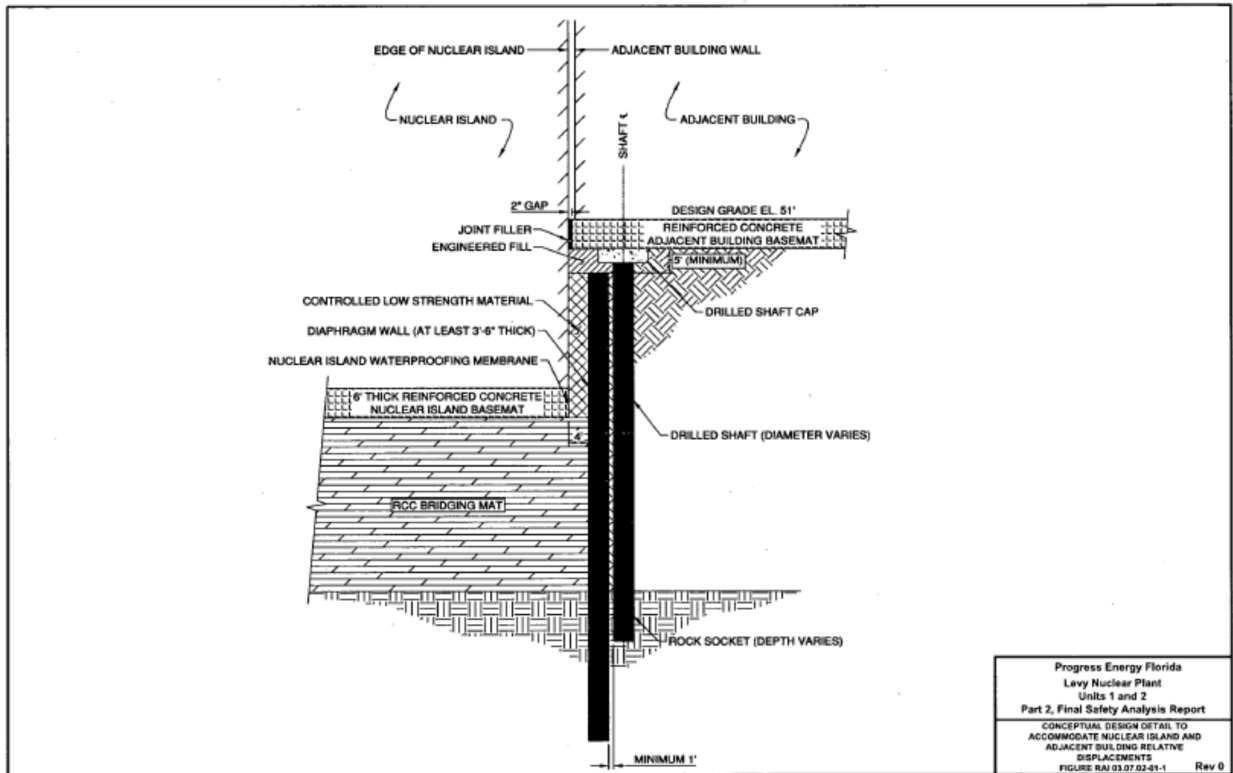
Detail Showing Location of CLSM Between Nuclear Island and Diaphragm Wall (RAI Figure 03.07.02-01-1)
